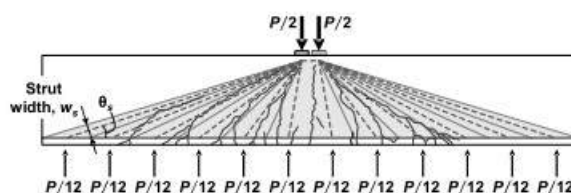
Application of the STM to a Spread Footing
